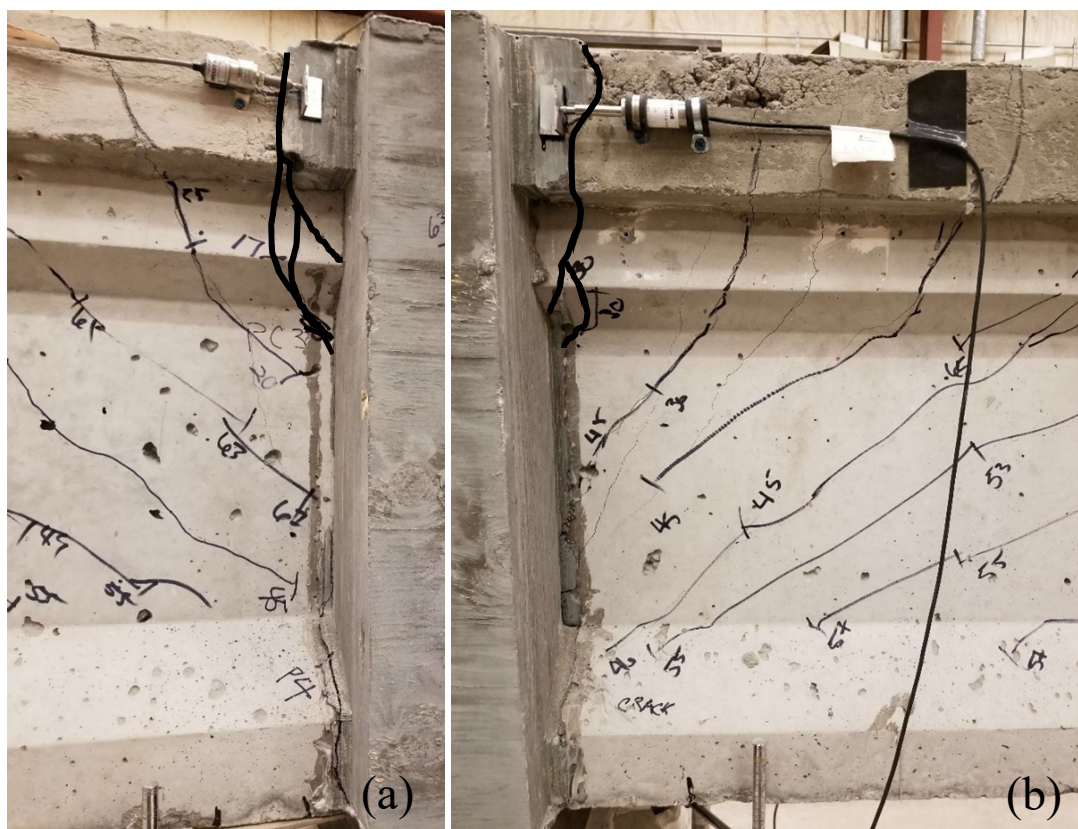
Joint separation at the interface between the RC3-N concrete deck and the UHPC joint with the flexural crack going vertically down in the girder (a) and joint separation at the joint interface between the RC3-S concrete deck and the UHPC joint with the flexural crack going vertically down into the girder (b) are indicated by dark lines.
